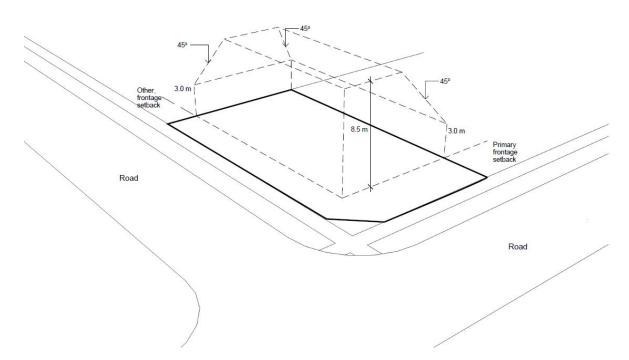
Building envelope for corner lots as required by clause 8.4.2 A3(a) and clause 8.5.1 A2(a)
